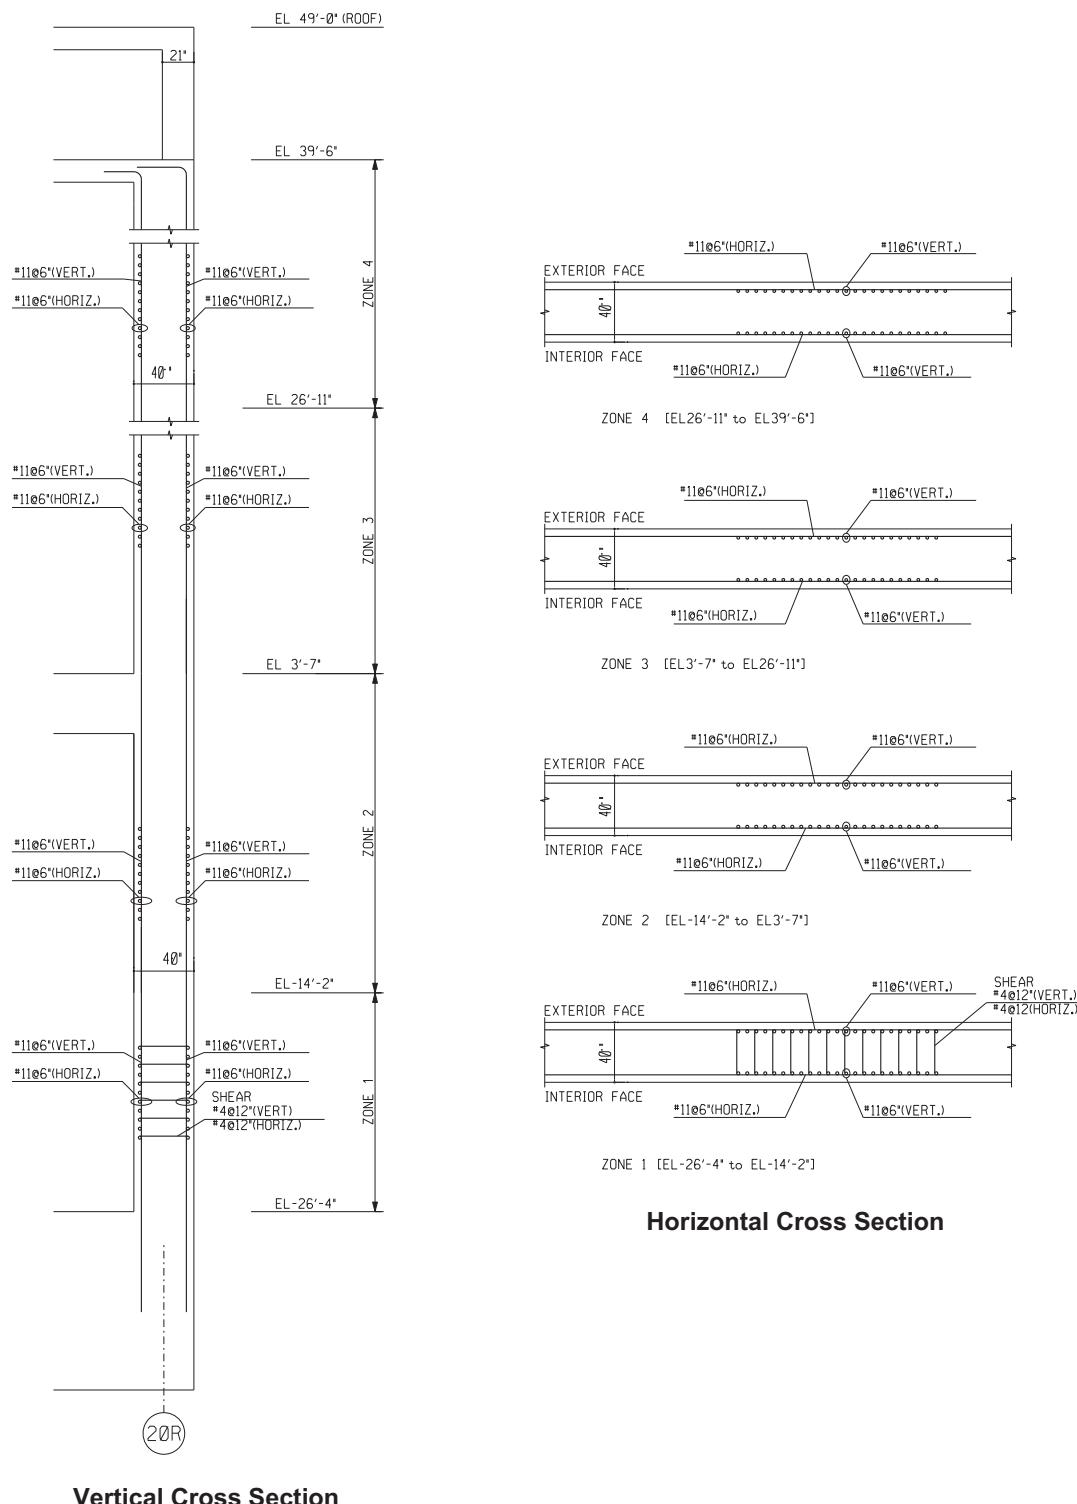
East PS/B Wall Representative Sections
